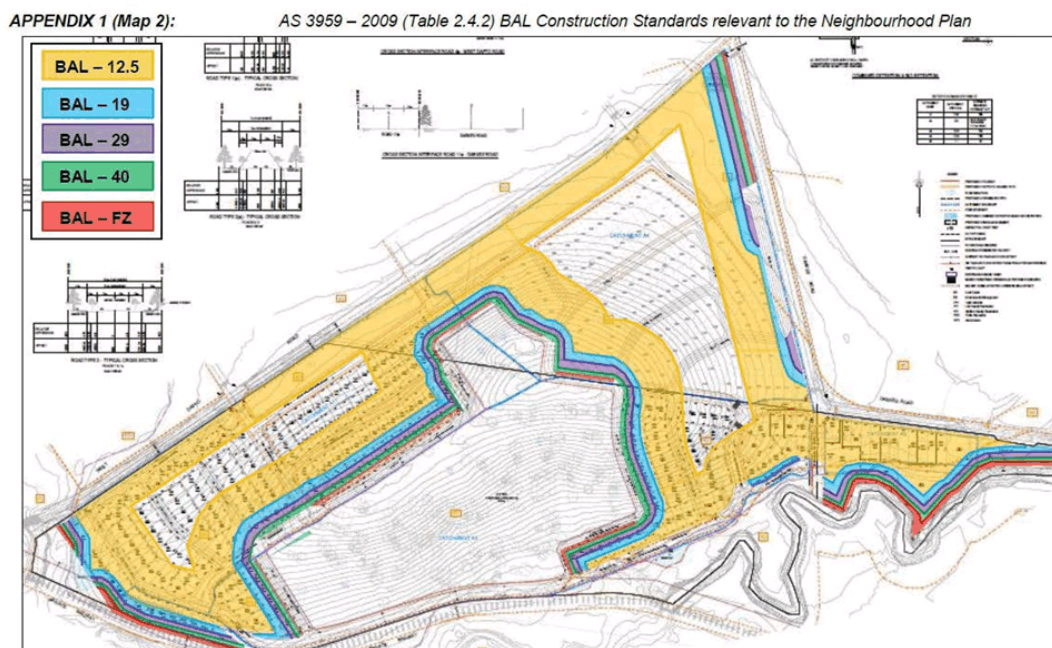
BAL Construction Standards relevant to the Neighbourhood Plan
